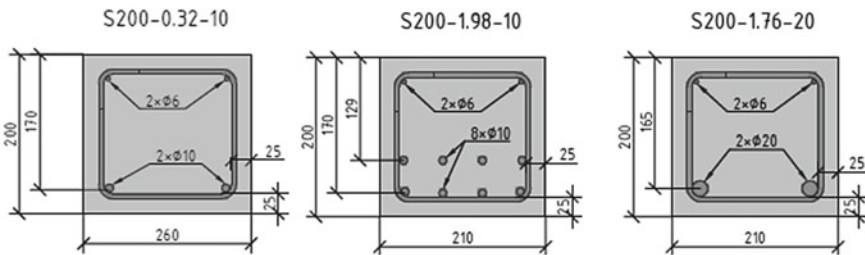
Cross-sections of test RC beams having 200 mm section height
